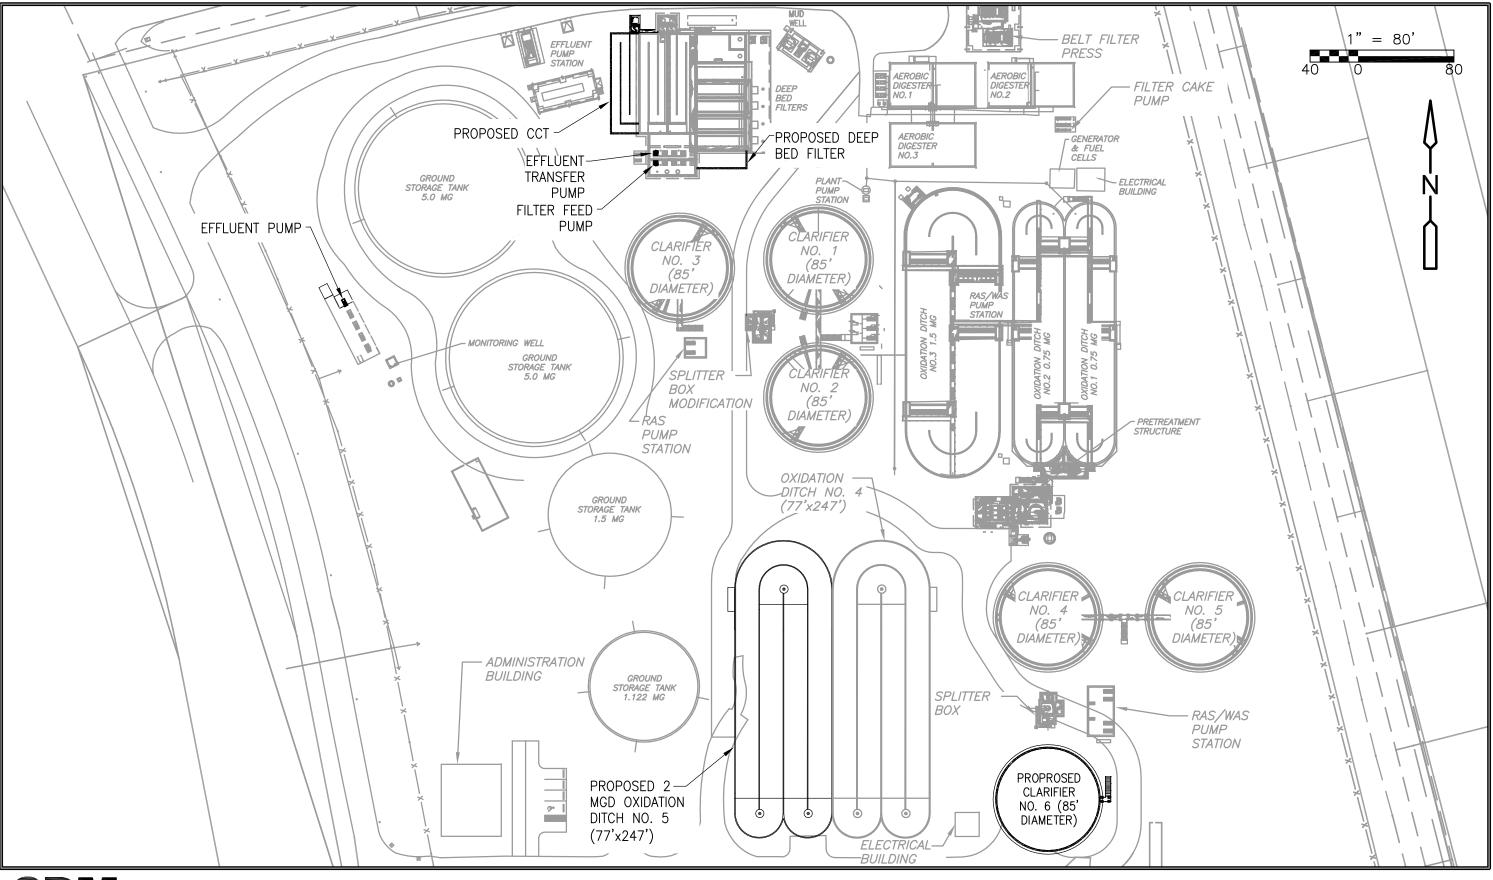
SITE PLAN FOR 8 MGD ADF PLANT EXPANSION DECEMBER 2013
